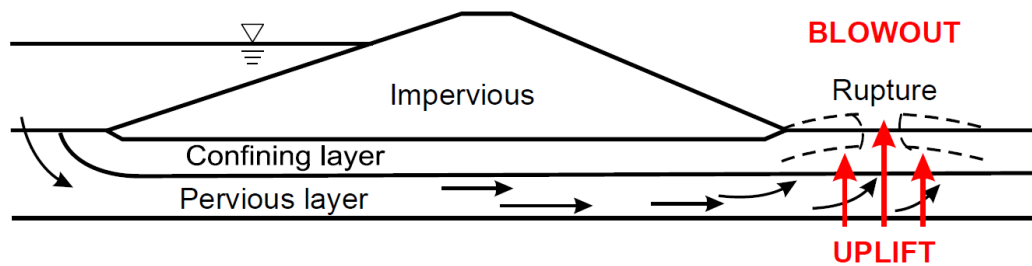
Uplift and/or Blowout at the Toe of an Embankment (Pabst et al. 2012)
